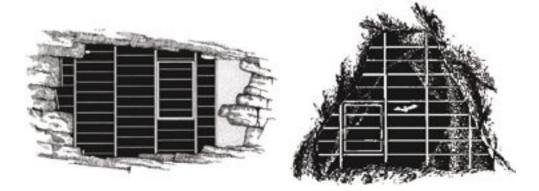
Examples of grilles fitted to horizontal entrances. Grilles can be made oversized and pinned to the rock face, fitted inside the entrance using bolts or pins or built into blockwork to square up and stabilise the entrance. Large grilles can be constructed off-site in sections and bolted or welded on site. A lockable entrance door should always be fitted.
